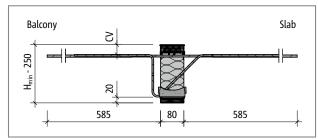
Schöck Isokorb® T type K-M1 to M4: Product section
